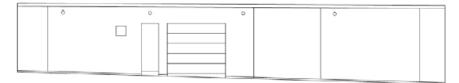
M-House Street Elevation D 1.361(Archi) and 1.257 (Benoit))
